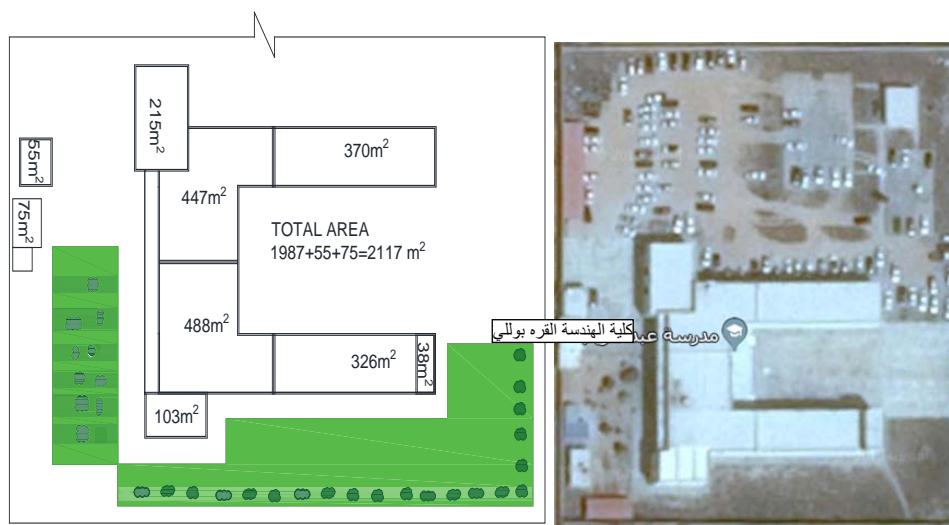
Garaboulli Engineering Building, Plan (left) and air photo (right)
